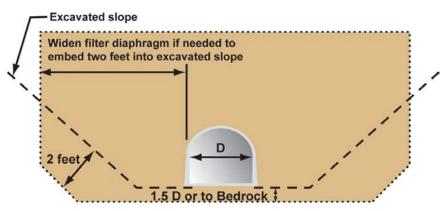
Typical configuration for filter diaphragm used in design of an embankment dam. The filter diaphragm should extend into the foundation soils, where an excavation is made for the conduit.
